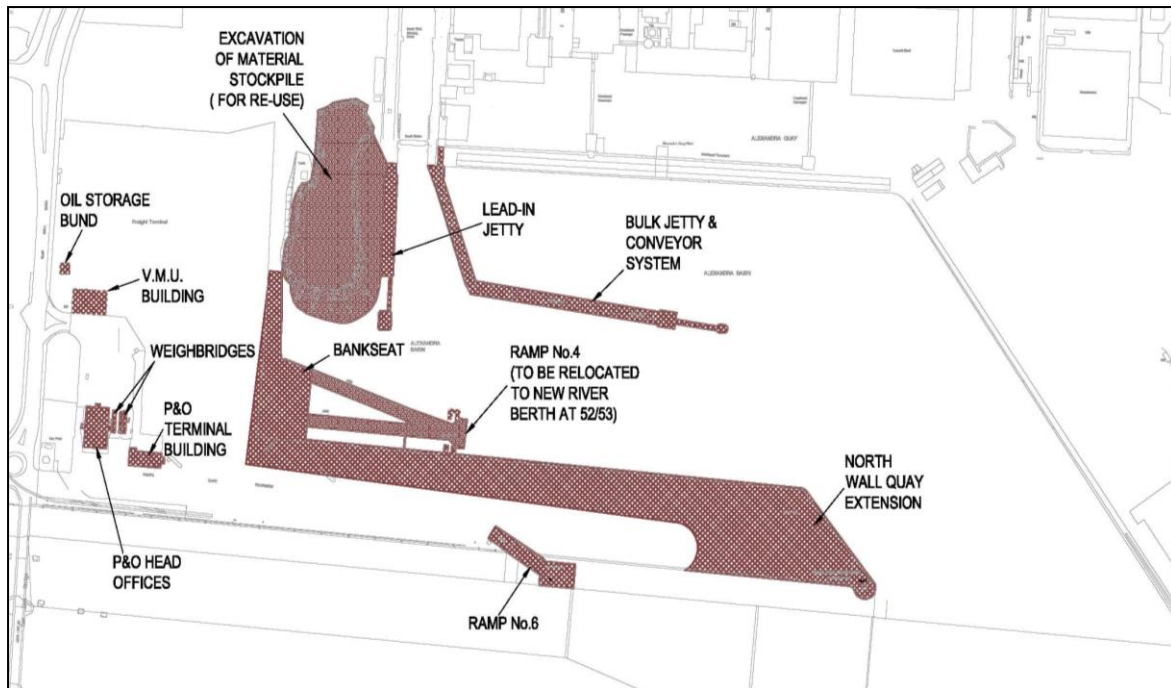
DEMOLITIONS AND EXCAVATIONS PROPOSED IN ALEXANDRA BASIN WEST
